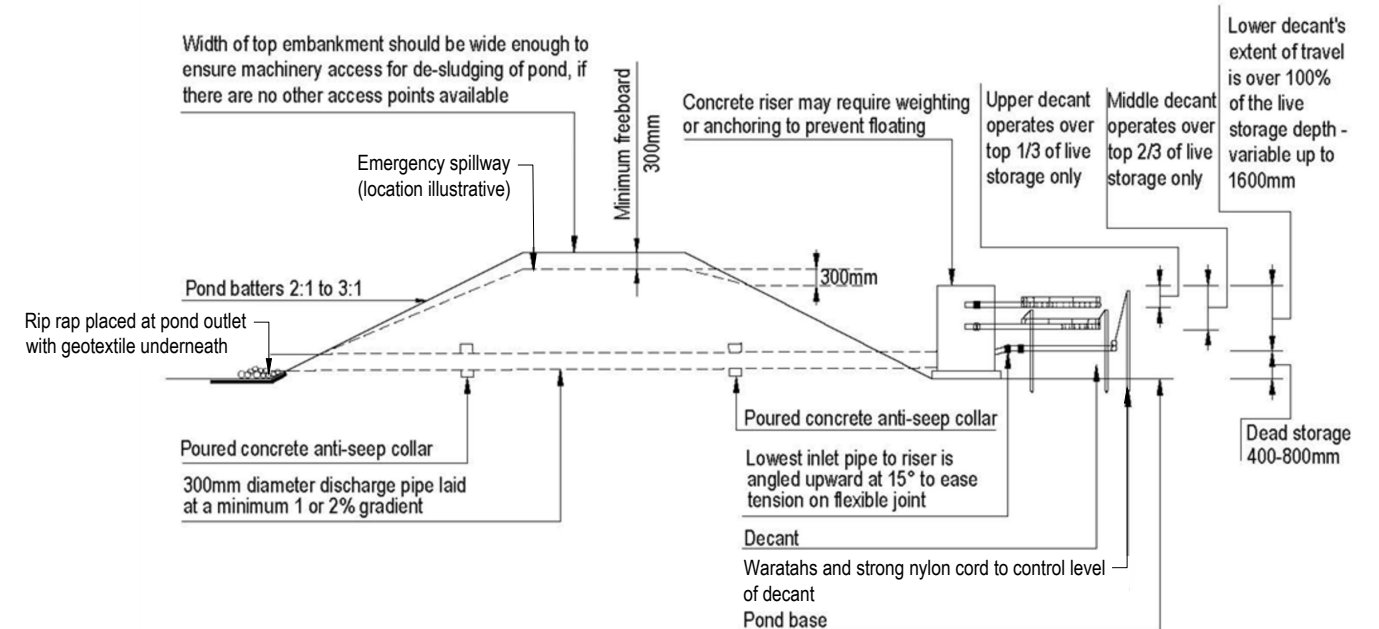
CROSS-SECTION OF OUTLET FOR 3-5ha CATCHMENT
